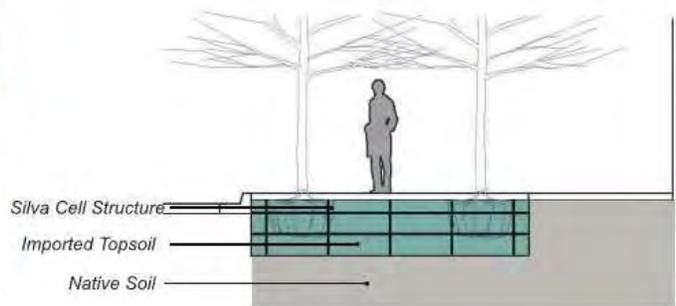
B: TREE PLANTING OPTIONS FOR STREETSCAPES
